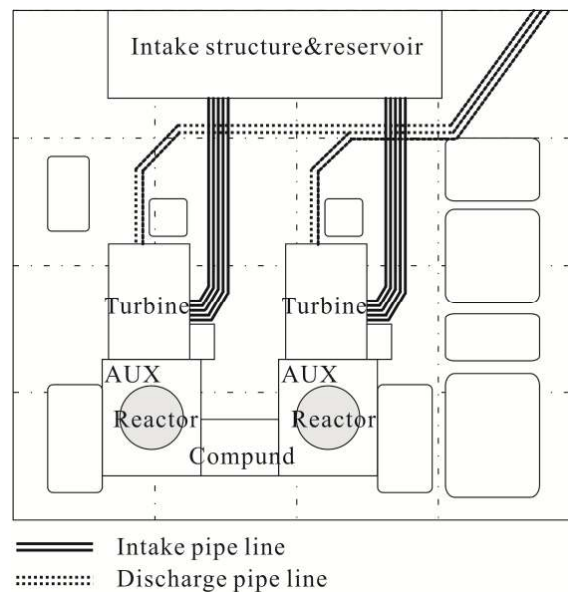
APR1400 NPP building component, facilities, GA, and pipeline arrangements
